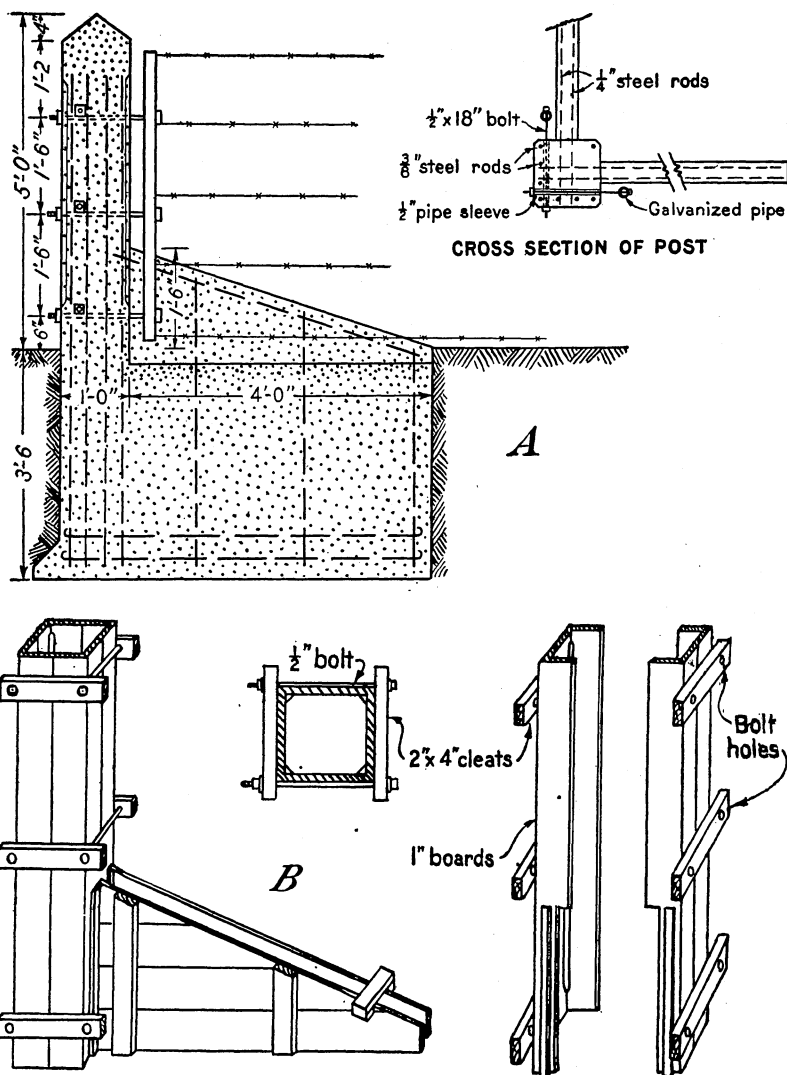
A, Concrete corner fence post; B, form for concrete corner fence post.
